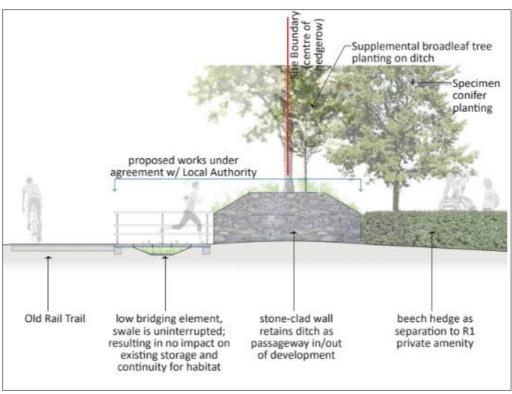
Extract from Landscape Section on Southern Connection to Greenway
